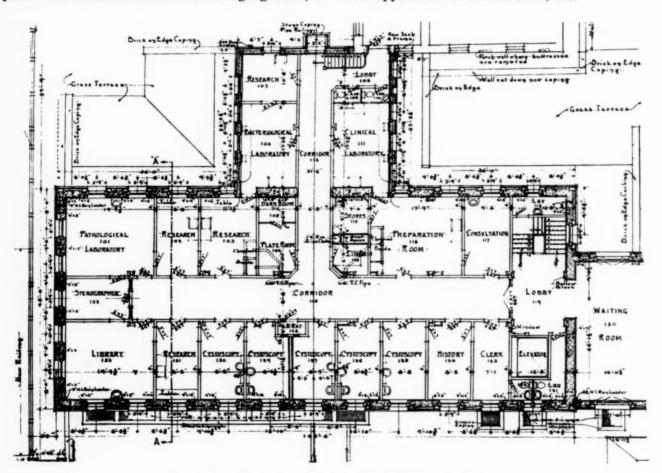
James Buchanan Brady Urological Institute-First story plan.
